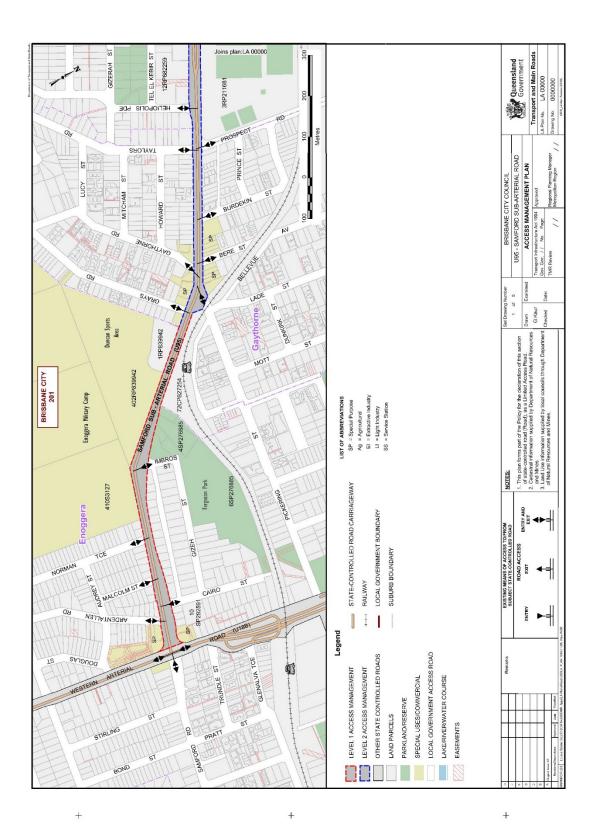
(d) – Limited Access Plan – No property access shown – Urban example
